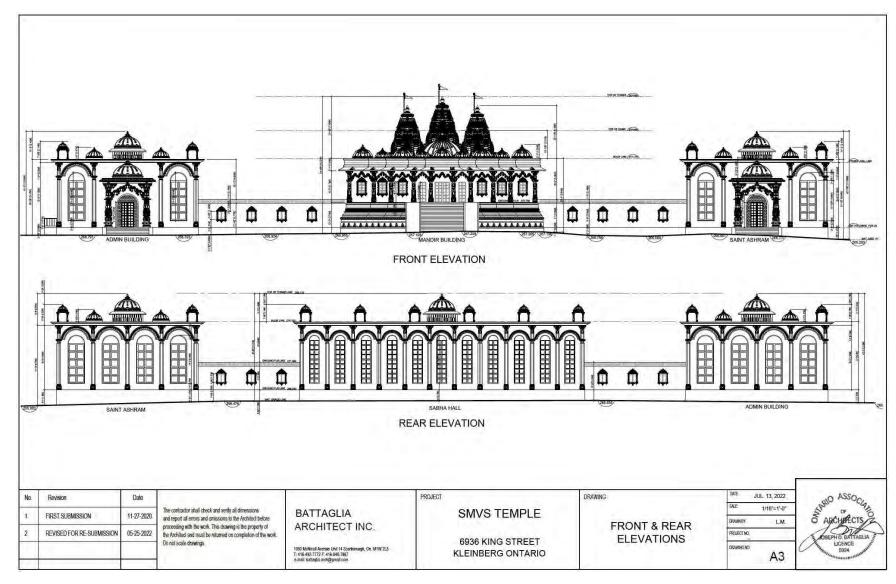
Proposed front and rear elevations (Battaglia Architects Inc.)
